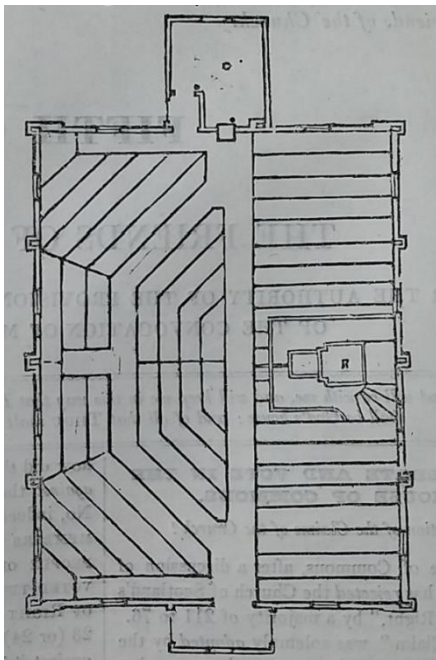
Ground Plan of the Smallest-sized Church (Provisional Committee of Ministers and Elders, Church of Scotland, 1843d: 4)
